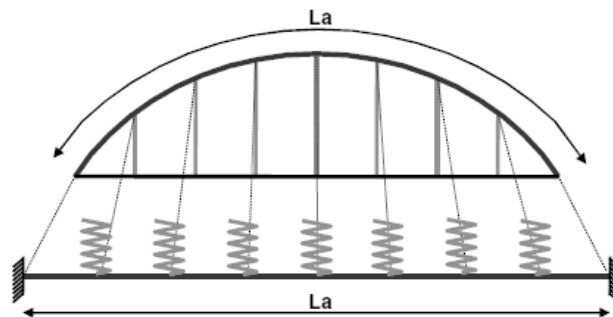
Hangers as Elastic Foundation of the Bowstring Bridge - (Gens F. , Design and Construction of Bridges - Chap 03b-2 - Bowstring Bridges, 2024)
